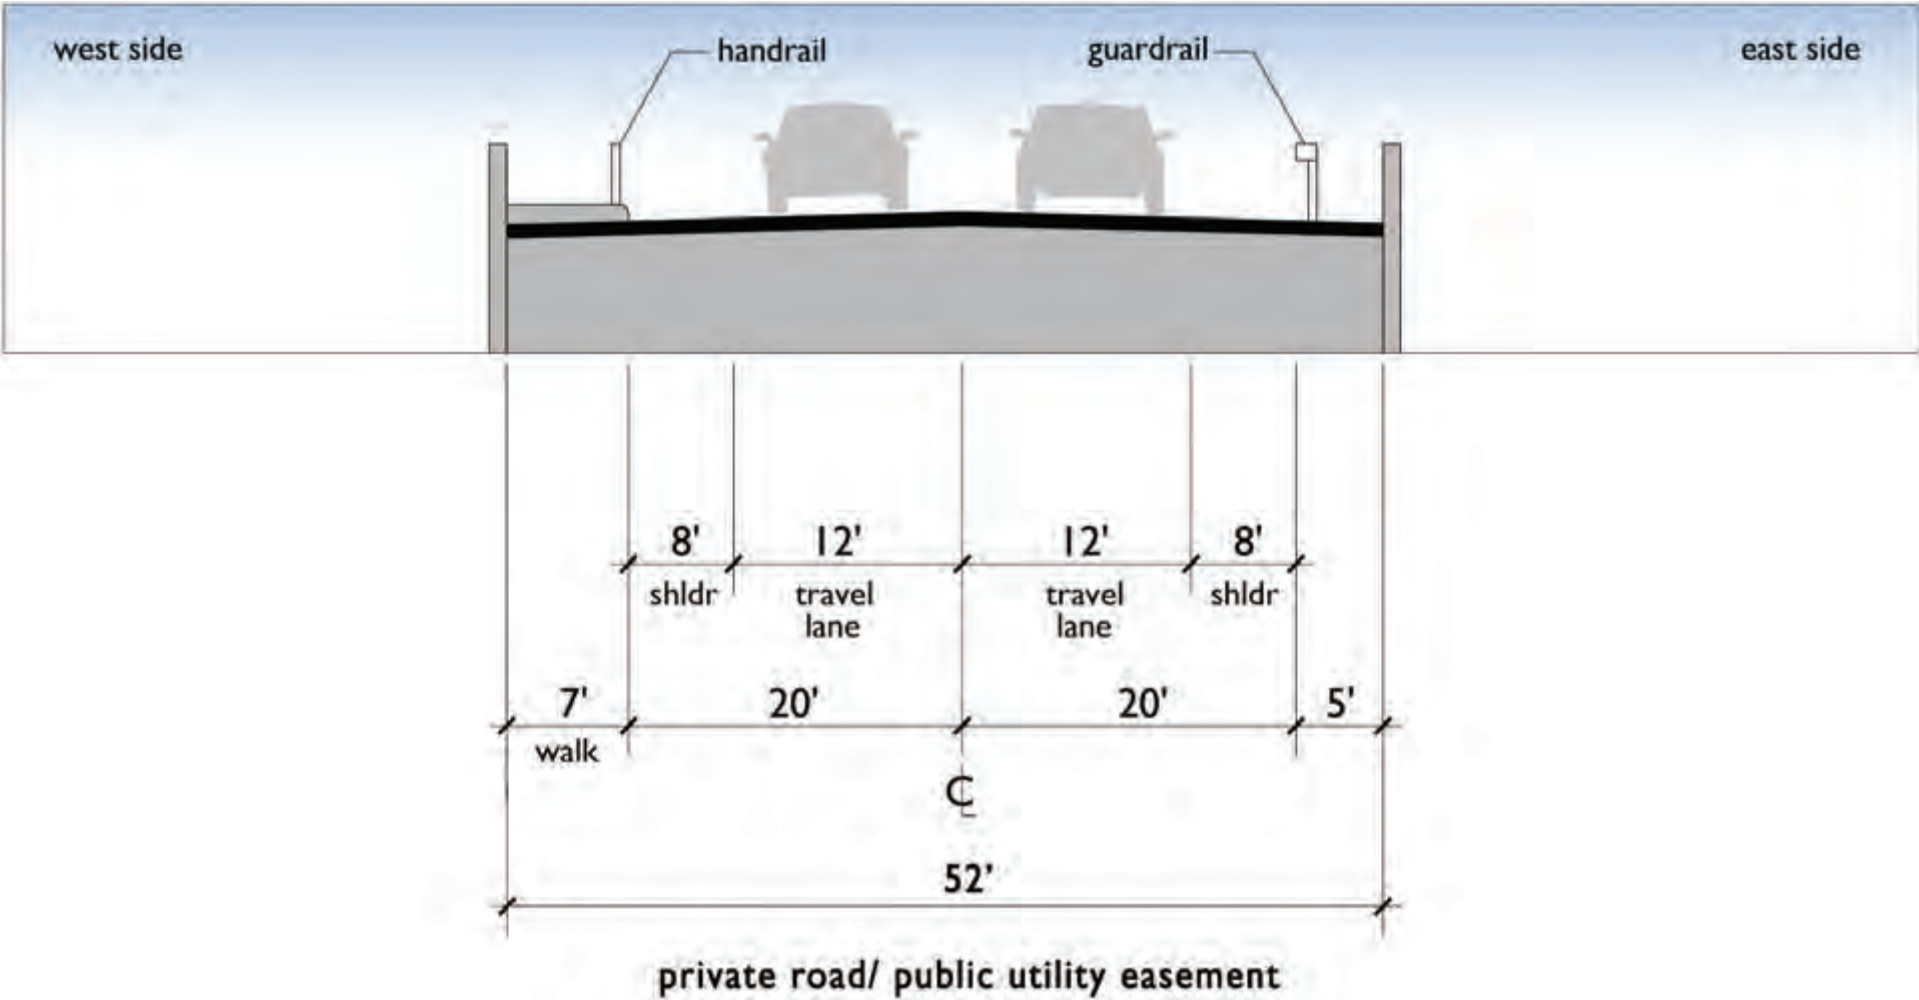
SECTION K: VILLAGE EAST ROAD BRIDGE
